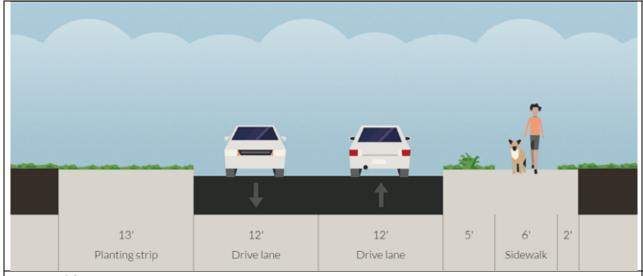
Proposed Configuration - Old Oaken Bucket Road - Central Street to Mt. Blue Street
